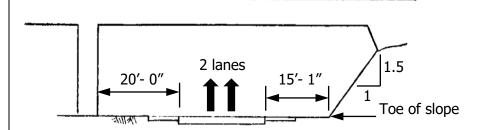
Bridge elevation view of horizontal clearances for a 2-lane highway feature with 1-way traffic below the bridge.
